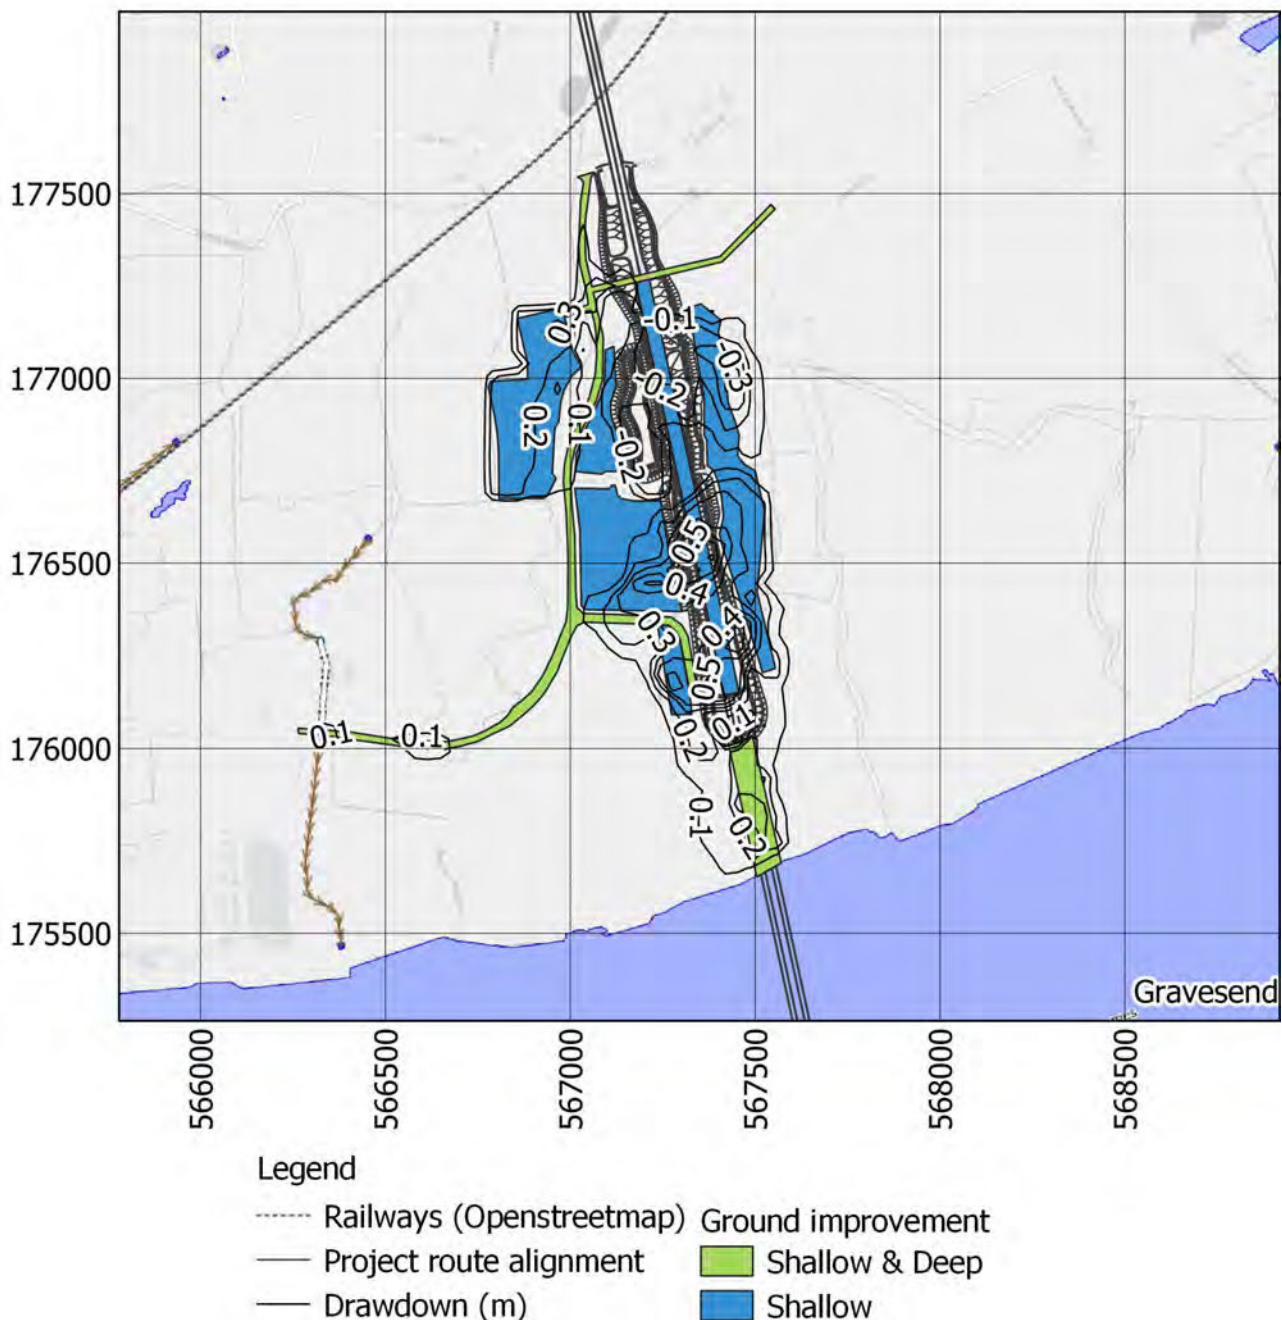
Ground Improvement layout. Tunnel ring stability DSM
